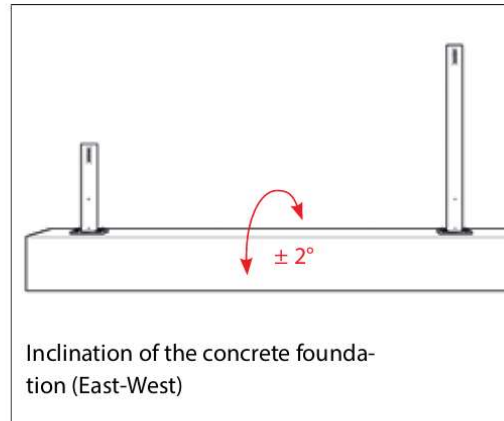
(east-west tilt of the concrete foundation)
